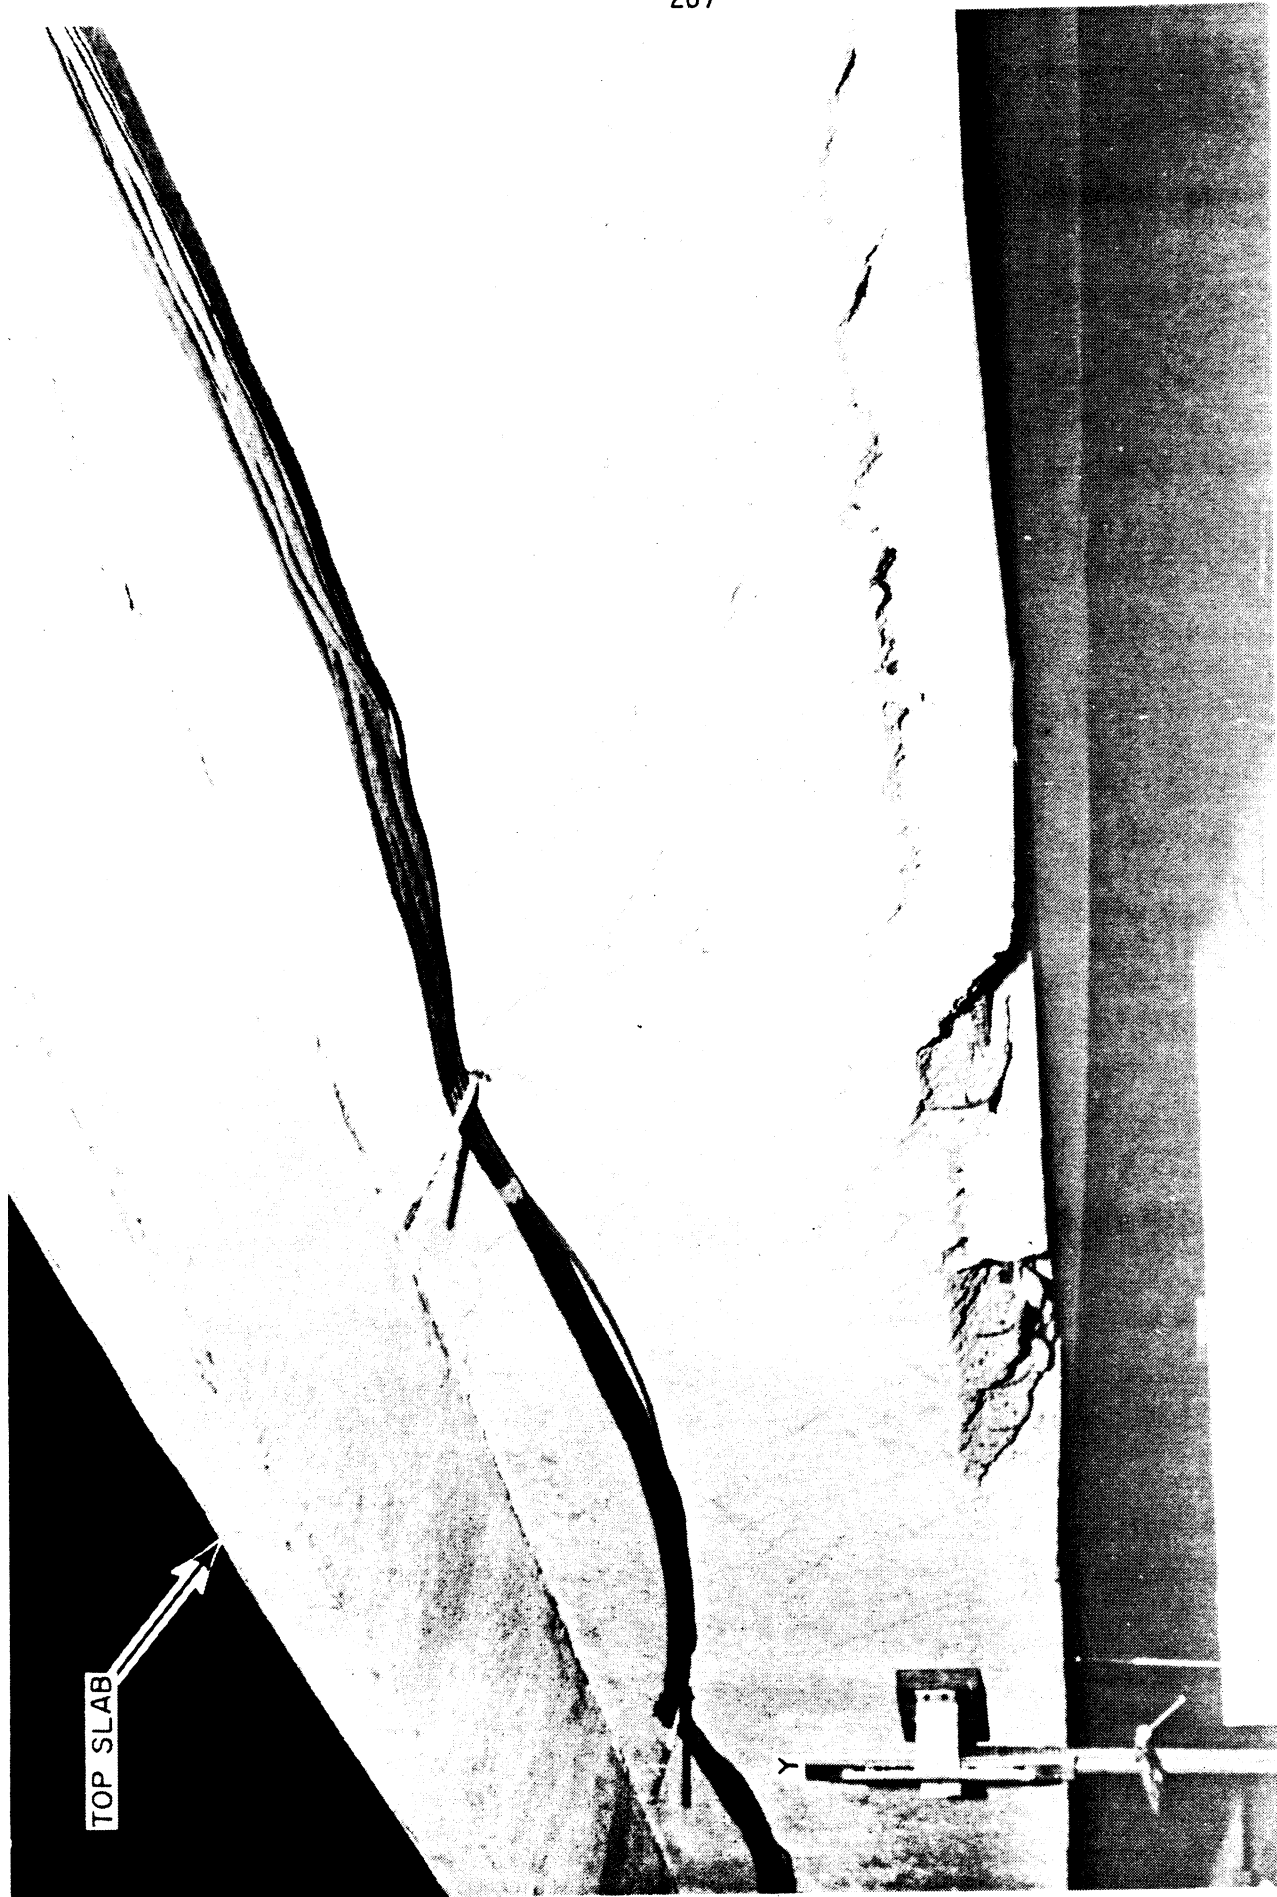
LOCAL FAILURE AT OUTER GIRDER 5 IN UNDIAPHRAGMED SPAN II NEAR SECTION Y -
